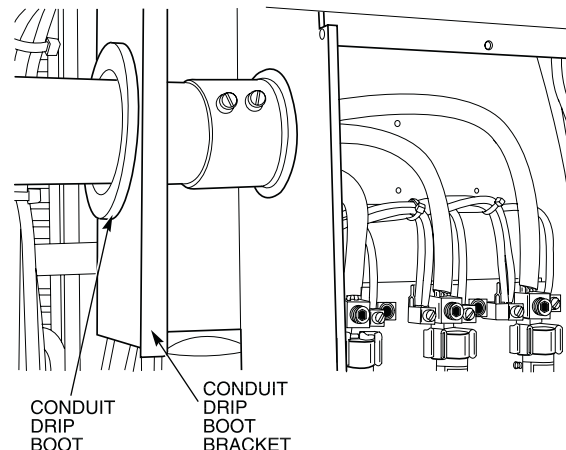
Conduit Installation (50TFF008-014 Shown)
